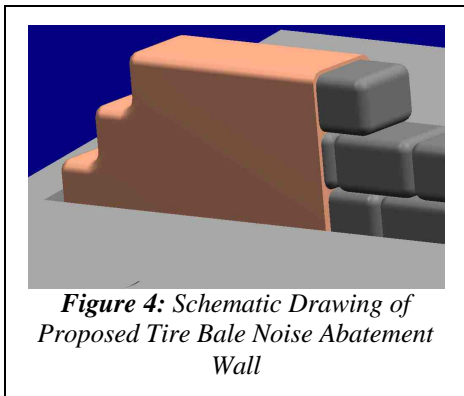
Schematic Drawing of Proposed Tire Bale Noise Abatement Wall
